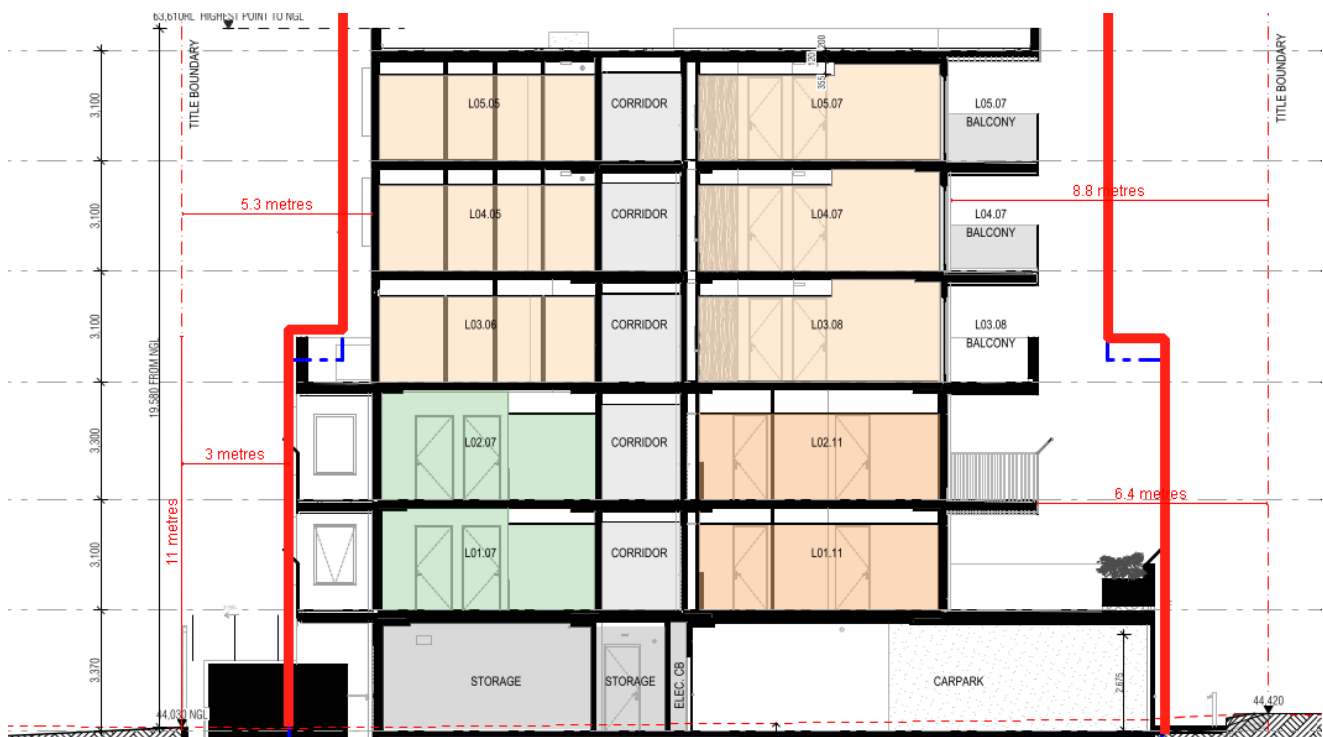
Extract of a typical section of the building showing compliance of the proposal against clause 55.02-3 where adjacent to the GRZ10 and NRZ3.
